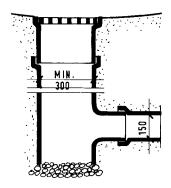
OPEN AND COVERED CONCRETE DRAINS
